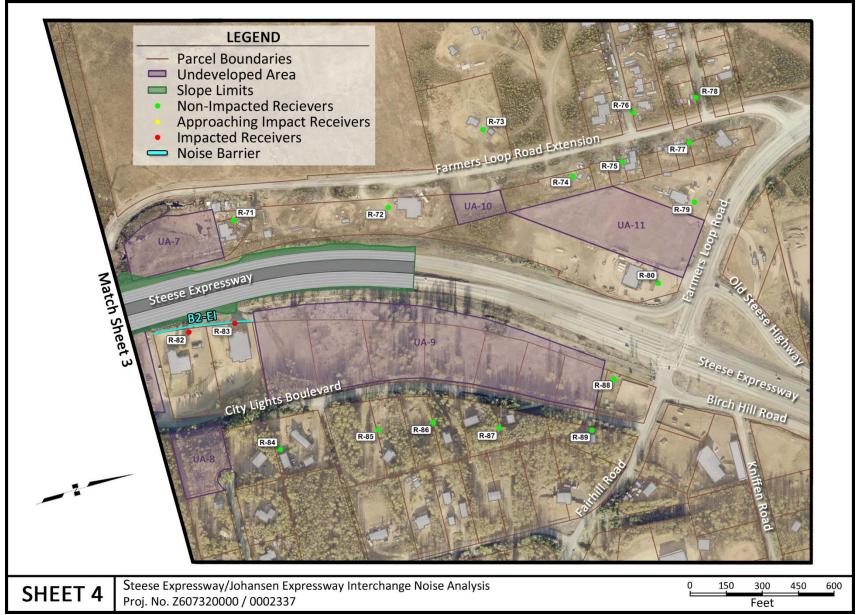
Echelon Interchange Noise Impacts and Proposed Barrier Walls, Sheet 4
